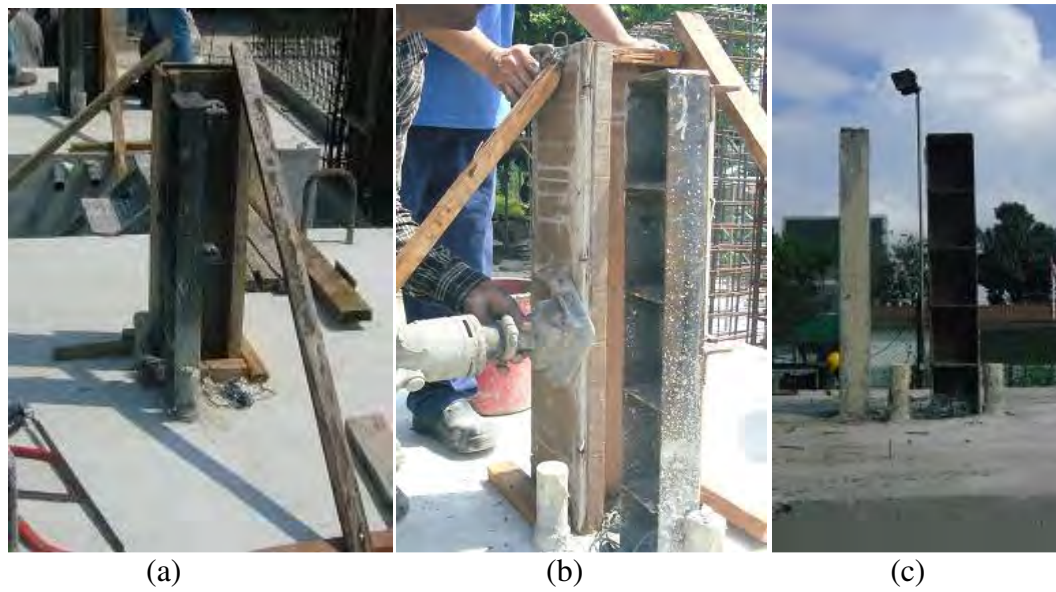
Construction of column, (a) Formwork (b) External vibrator (c) Hardened column
